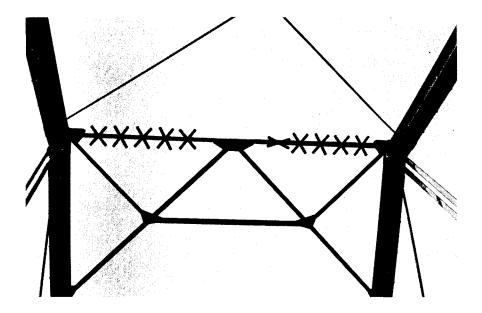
Portal detail on Pratt truss in Figure 18 showing decorative ironwork feature of Canton Bridge Co., Canton, Ohio. (Pittsylvania County, photo no. 12520-15-1.)
